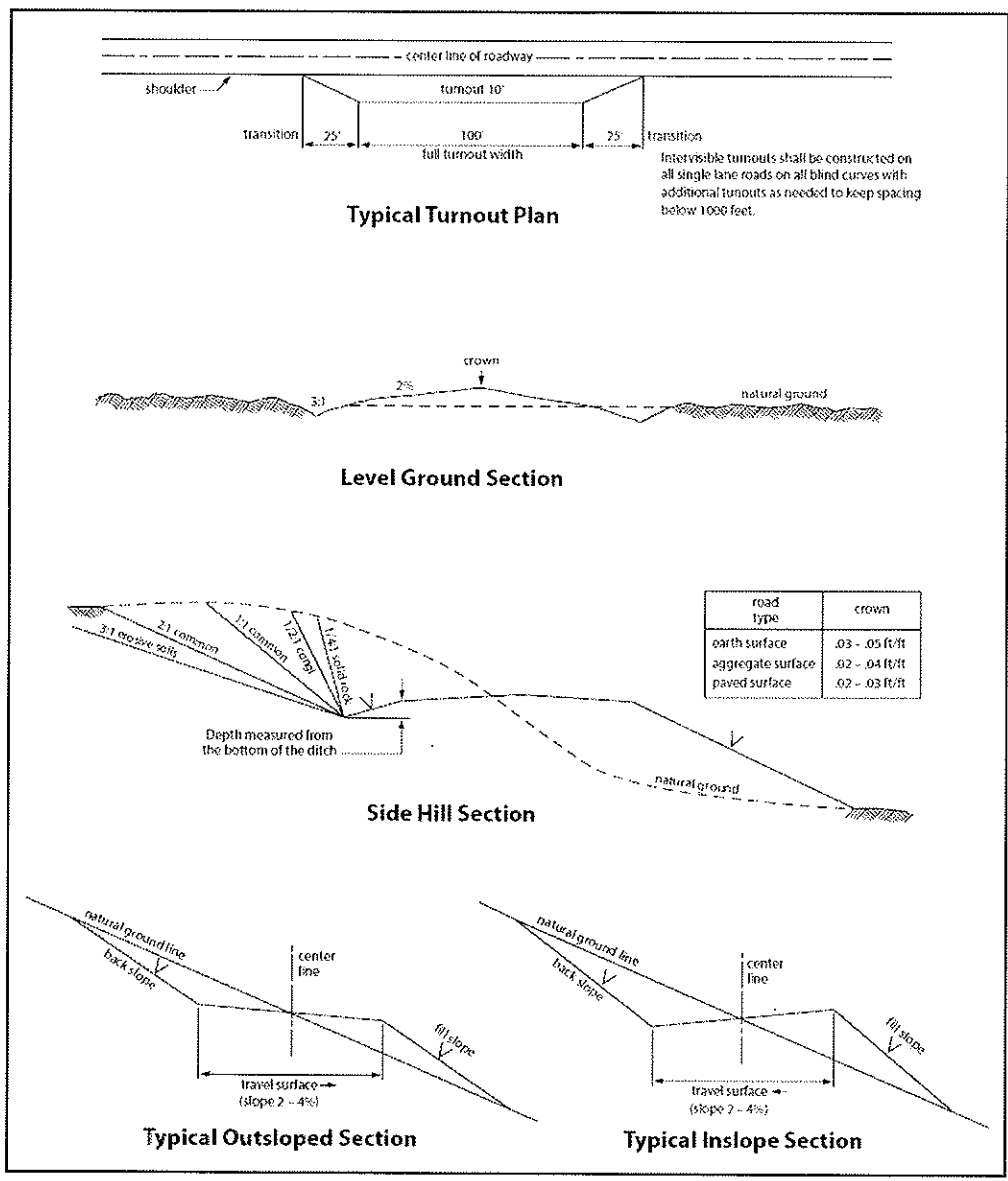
Typical road cross sections (BLM and USFS 2007).
